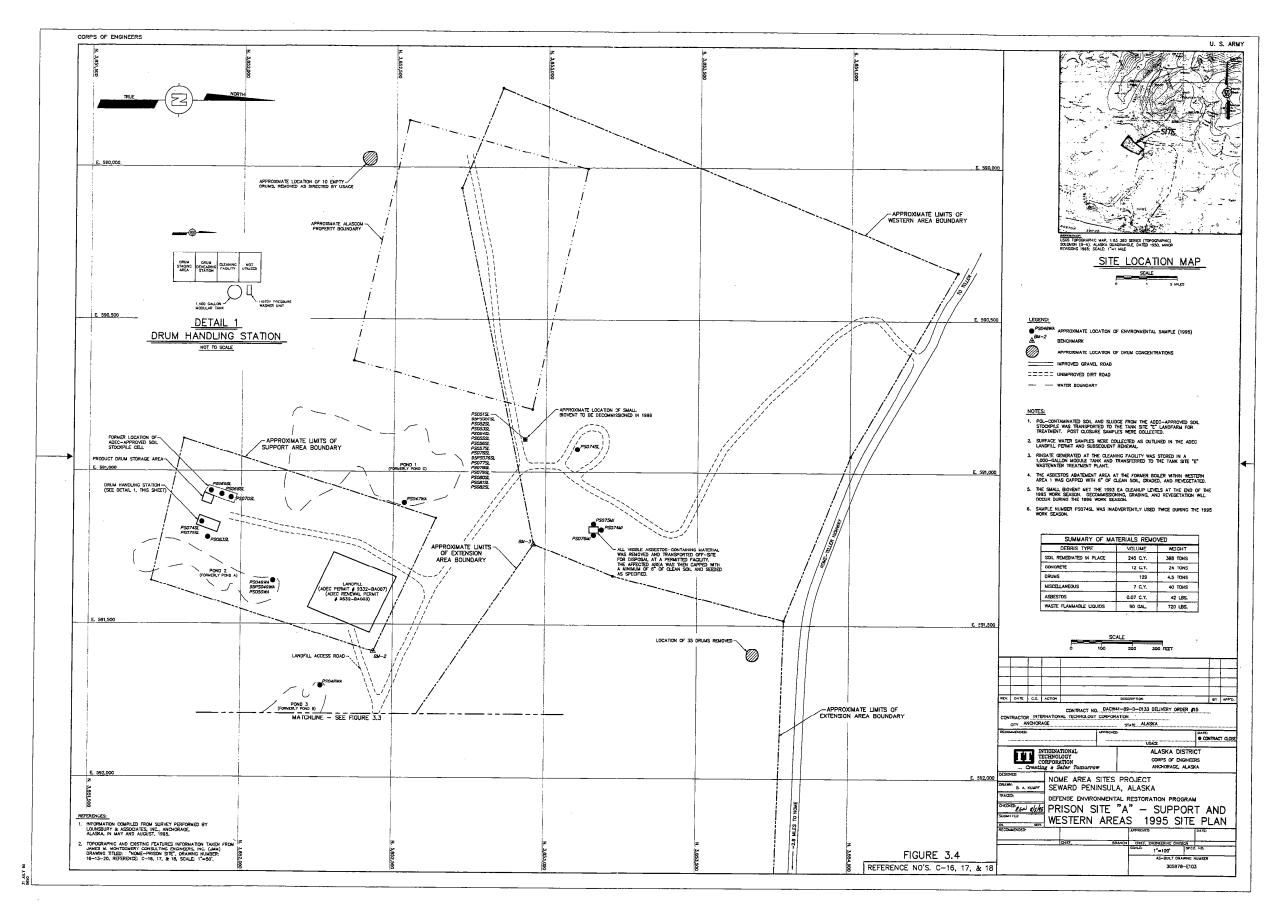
Prison Site 'A' Support and Western Areas 1995 Site Plan
